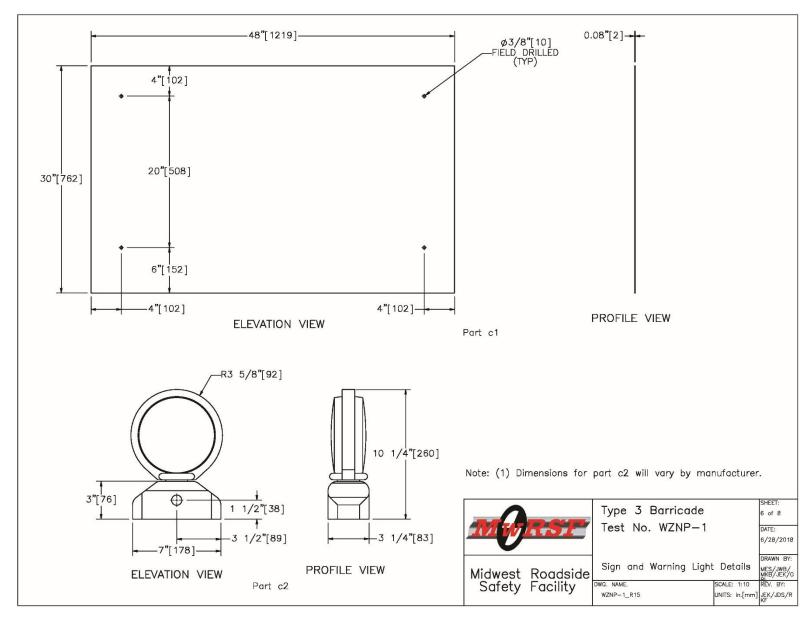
Sign and Warning Light Details, Test No. WZNP-1
